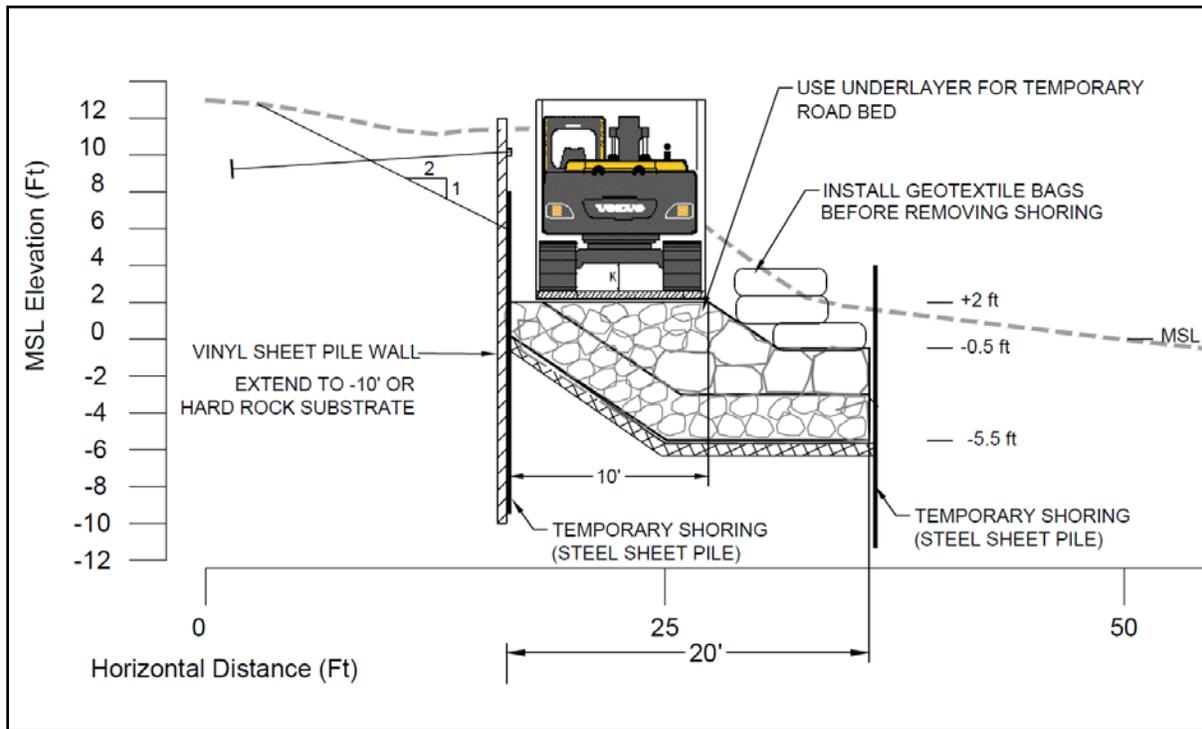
Construction of temporary road bed and structure toe – Phase 1, construction moving south.
